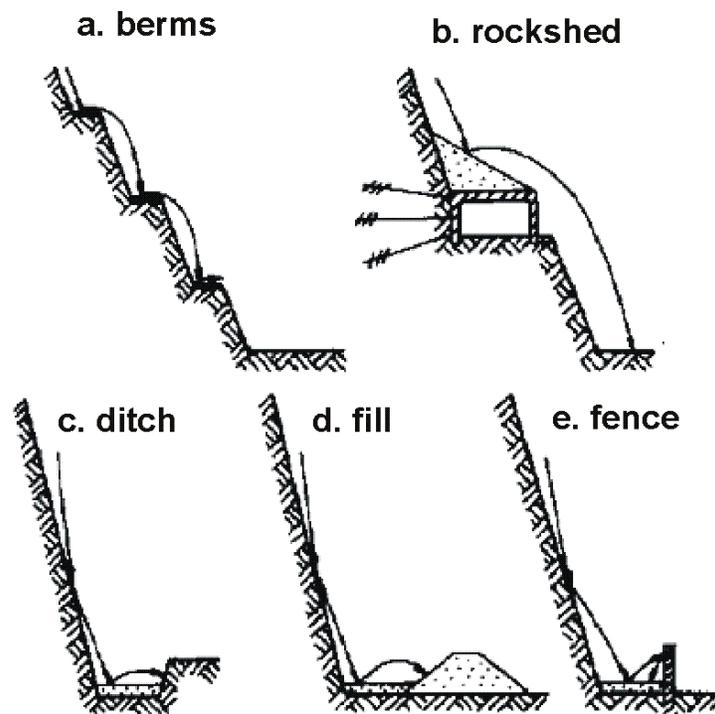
Possible measures to reduce the damage due to rockfalls. After Spang (1987).
